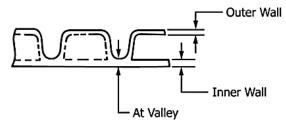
Typical Profile Wall Polyvinyl Chloride Pipe Cross Sections (WSDOT 2008)
